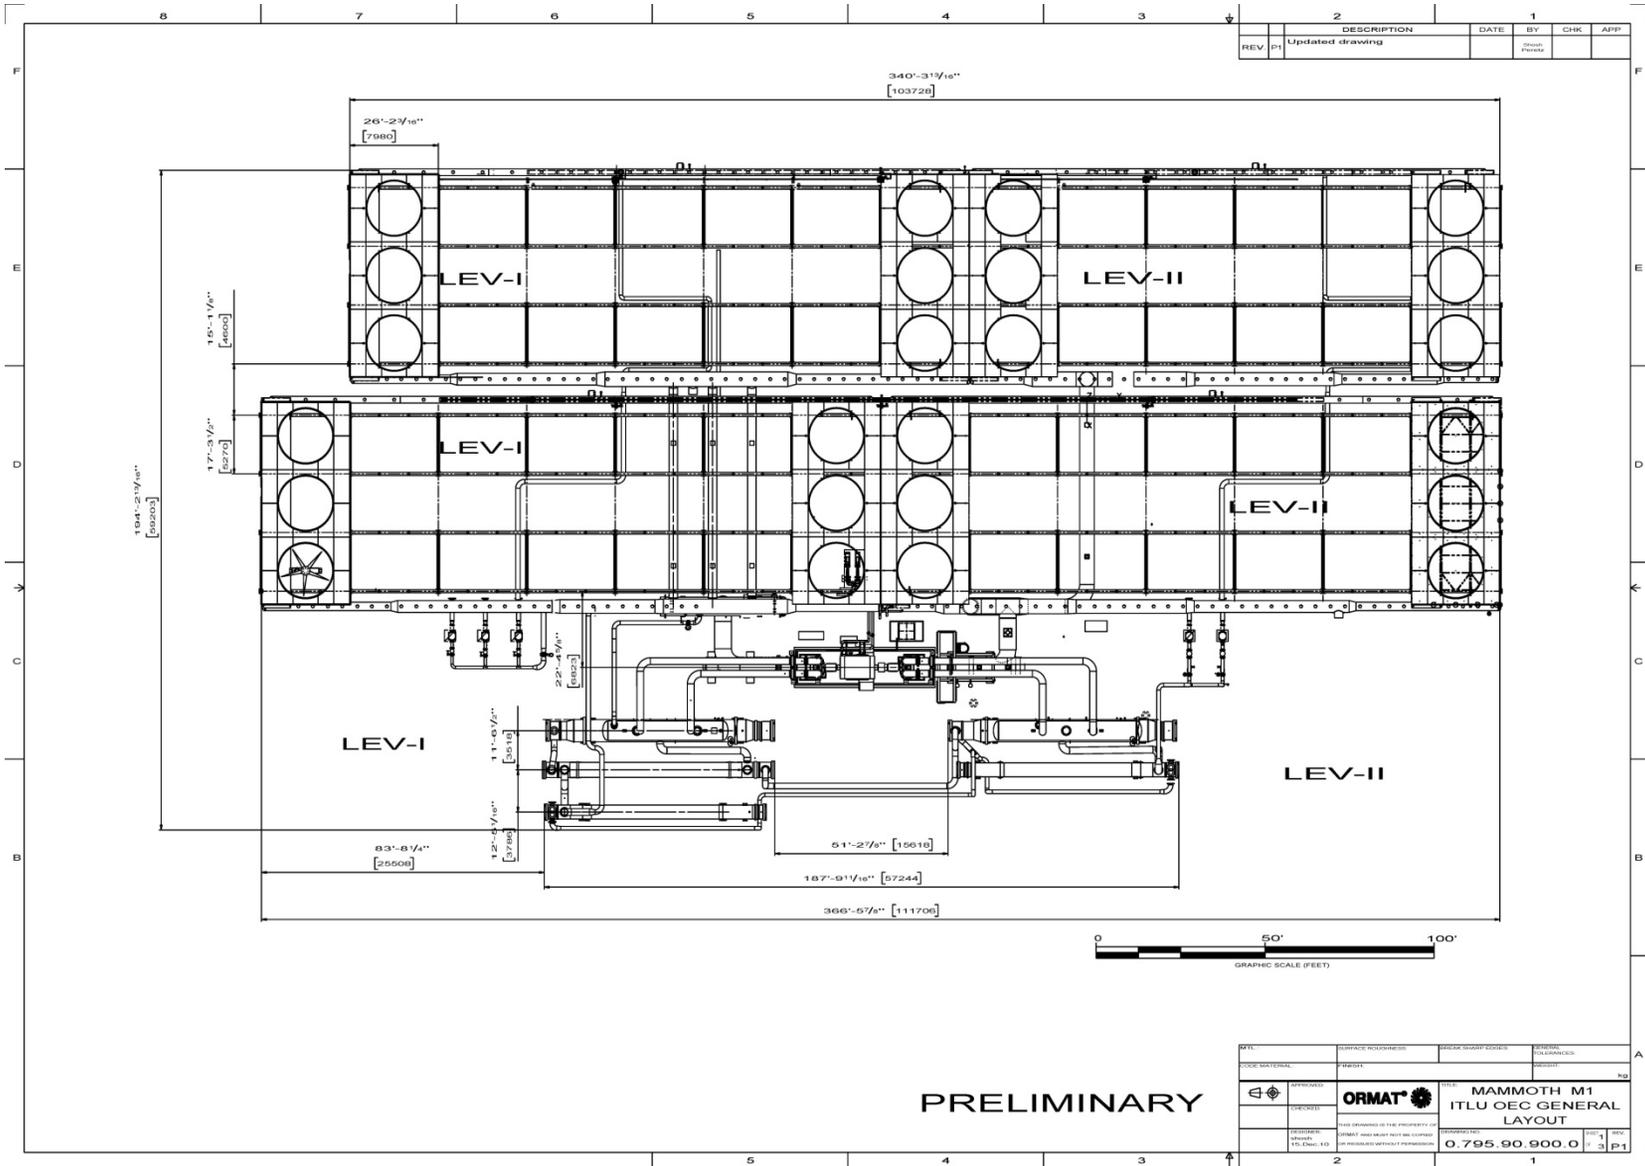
Plan View of the Proposed M-1 Replacement Plant ITLU OEC Facilities
